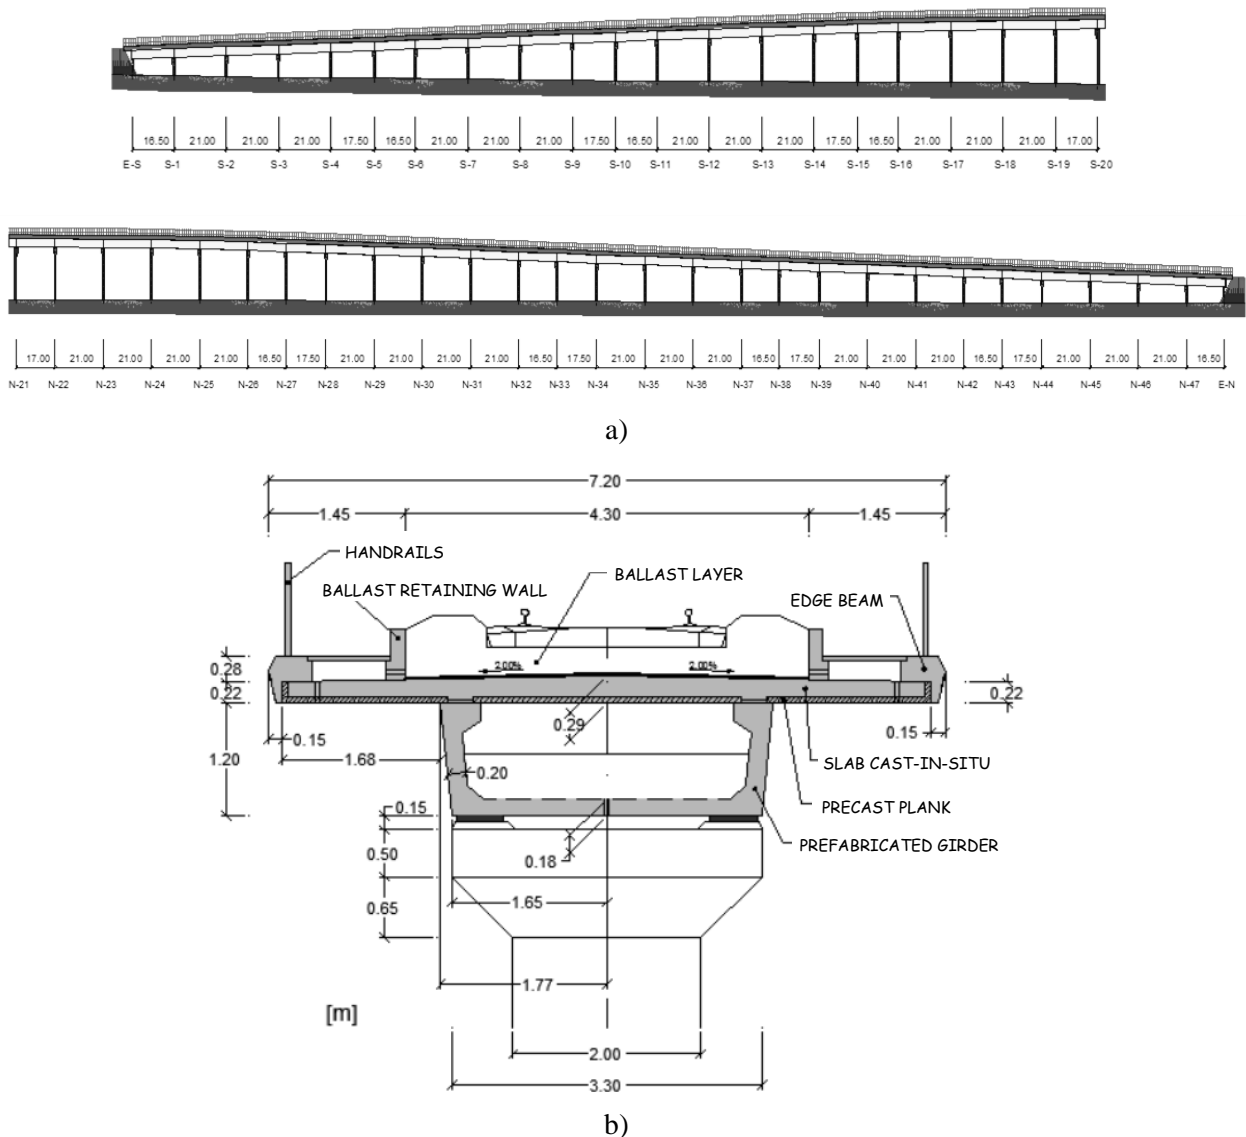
Alverca railway viaduct: a) elevation view of the north and south ramps; b) cross section of the deck over piers
